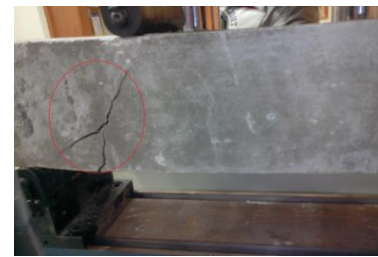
Crack pattern in beam with 200 mm 200 mm spaced welded stirrups
